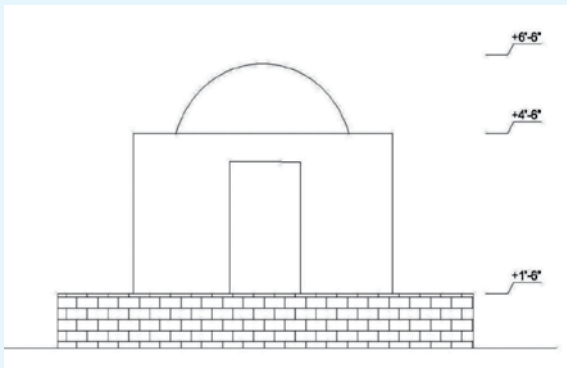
Storage Room II- front elevation (drawing by Rezeearcher)
